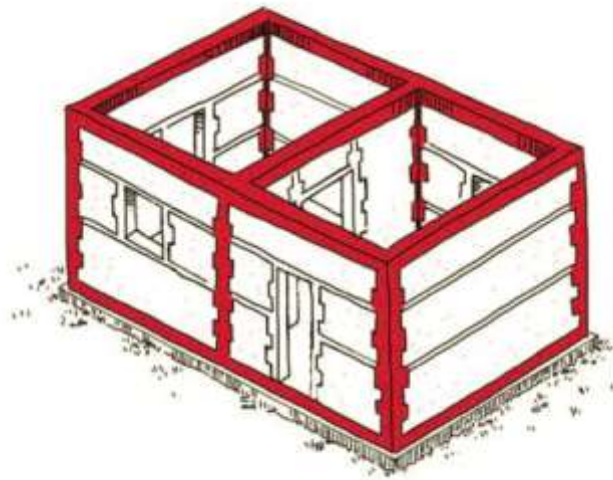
Confined masonry structure with proper tie columns, grade beam, and ring beam in red (Image source: SDC 2018)
